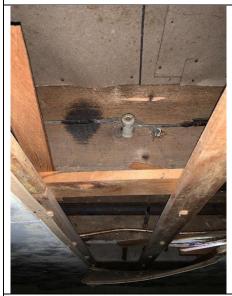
Mold noted on ground floor structure [JCAL 2021]
